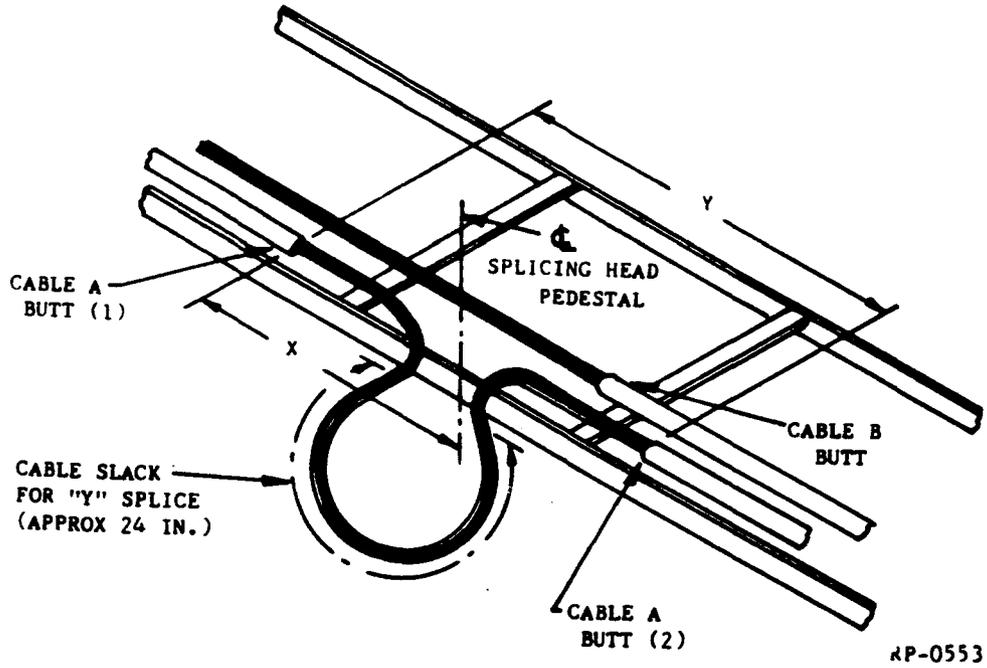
POSITION OF CABLES AND SPLICING HEAD IN "Y" SPLICE
